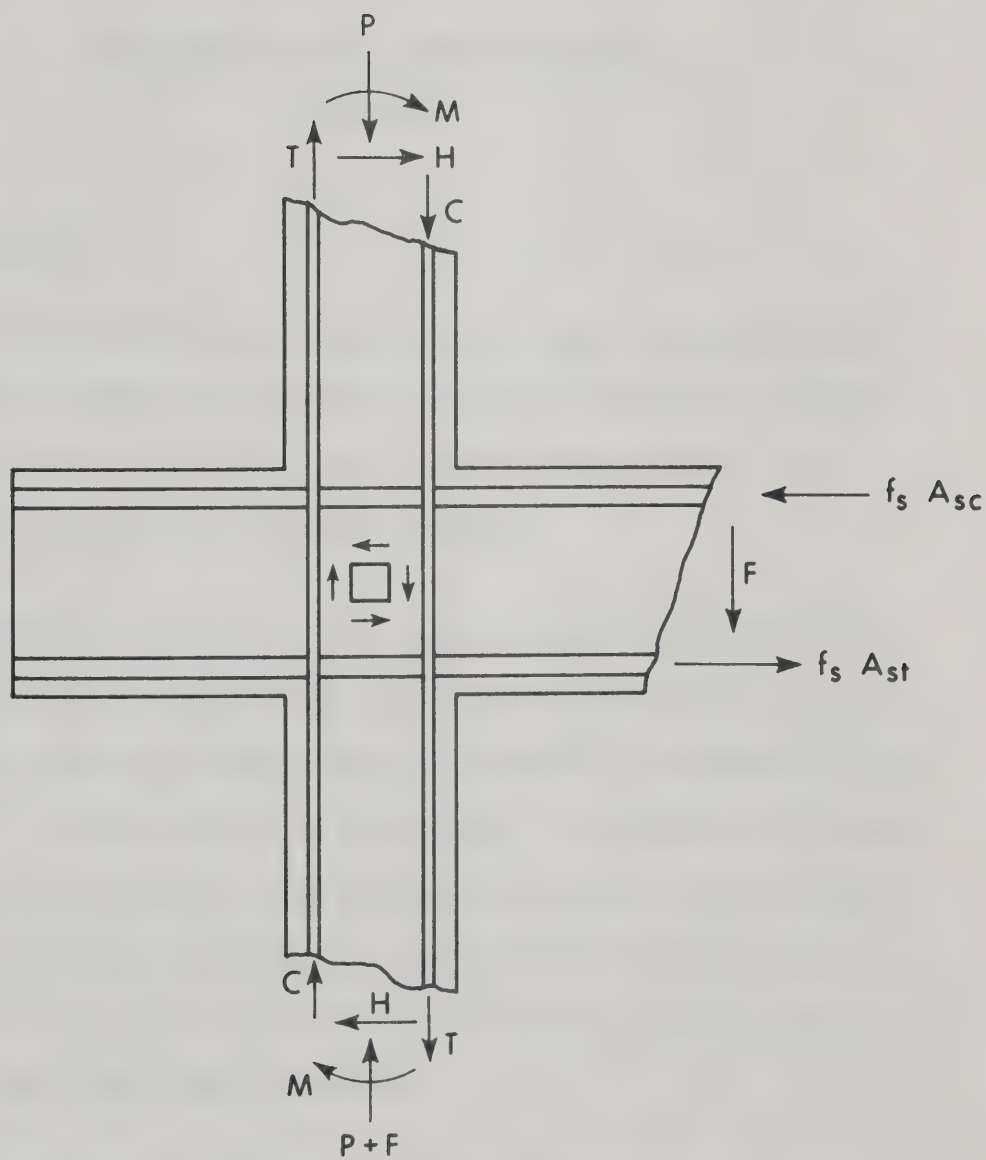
FORCES ON BEAM - COLUMN JOINT
